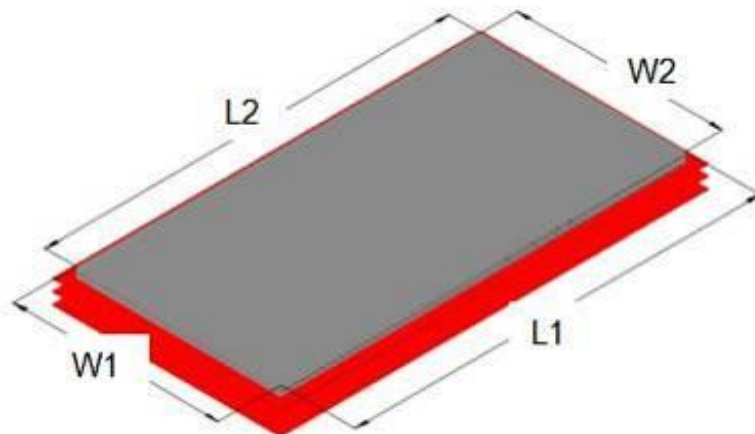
Dimensional Measurements for 4 edges of FC sheet
